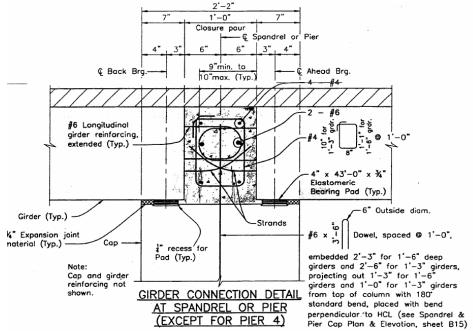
Continuity detail over the cross piers used on Castlewood Canyon Bridge, Colorado
